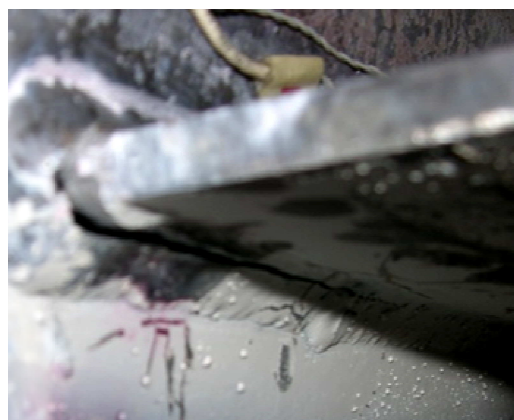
W2 in North Gusset-to-Beam Weld
